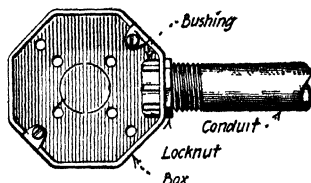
Fourth step, conduit pulled back until bushing bears on box side and locknut set up tight.
